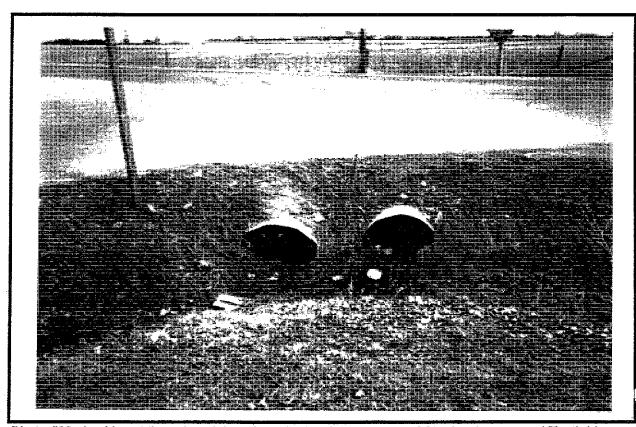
Looking at the culvert inlets from the Northwest corner of Steeles Avenue and Tenth Line.
